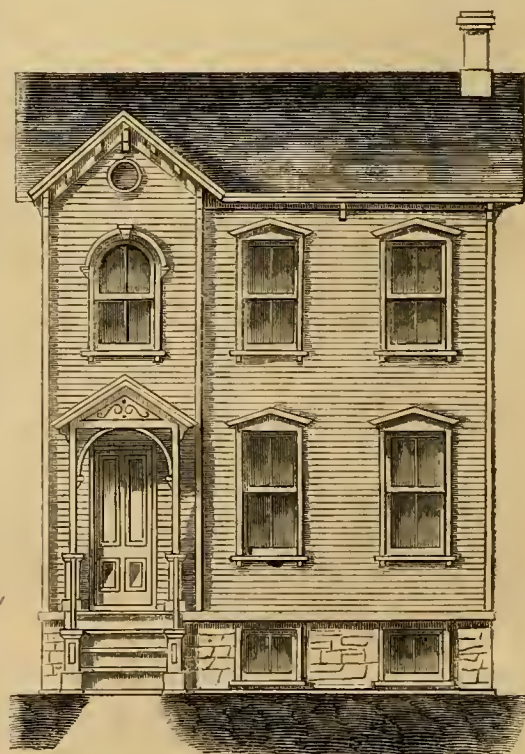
FRONT ELEVATION.—Scale, 8 feet to 1 inch.
